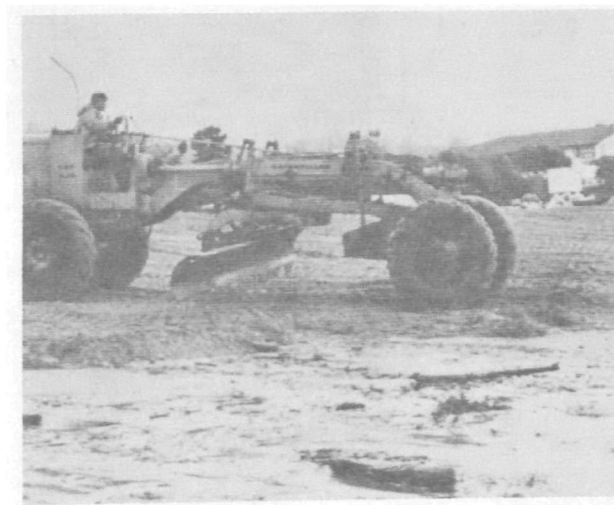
Grader Modified with Tines Welded to Blade
